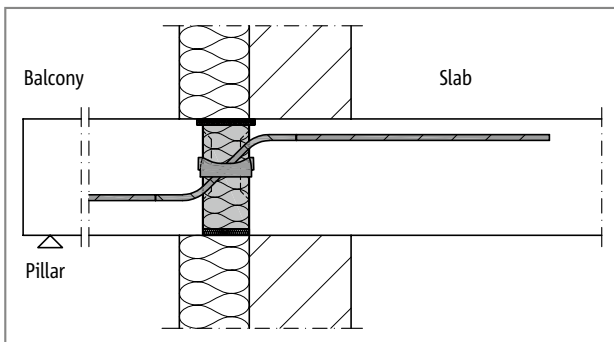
Schöck Isokorb® T type Q-E: Connection for exterior insulation
